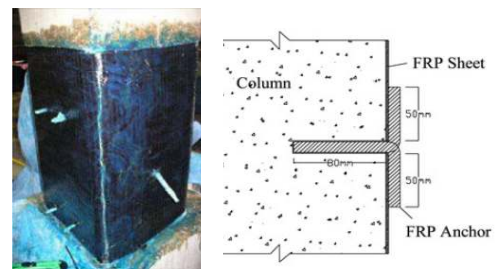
Reinforced Method(Qzcan et al., 2008)
